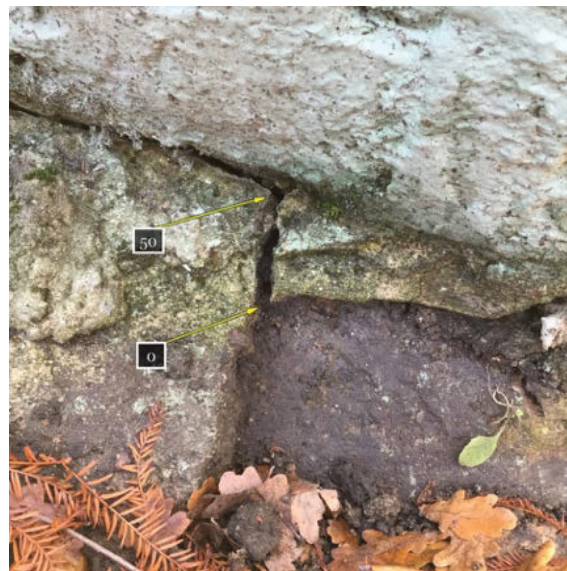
Photographed 14.12.16 – 0 identifies the origin and the first measurement point.
